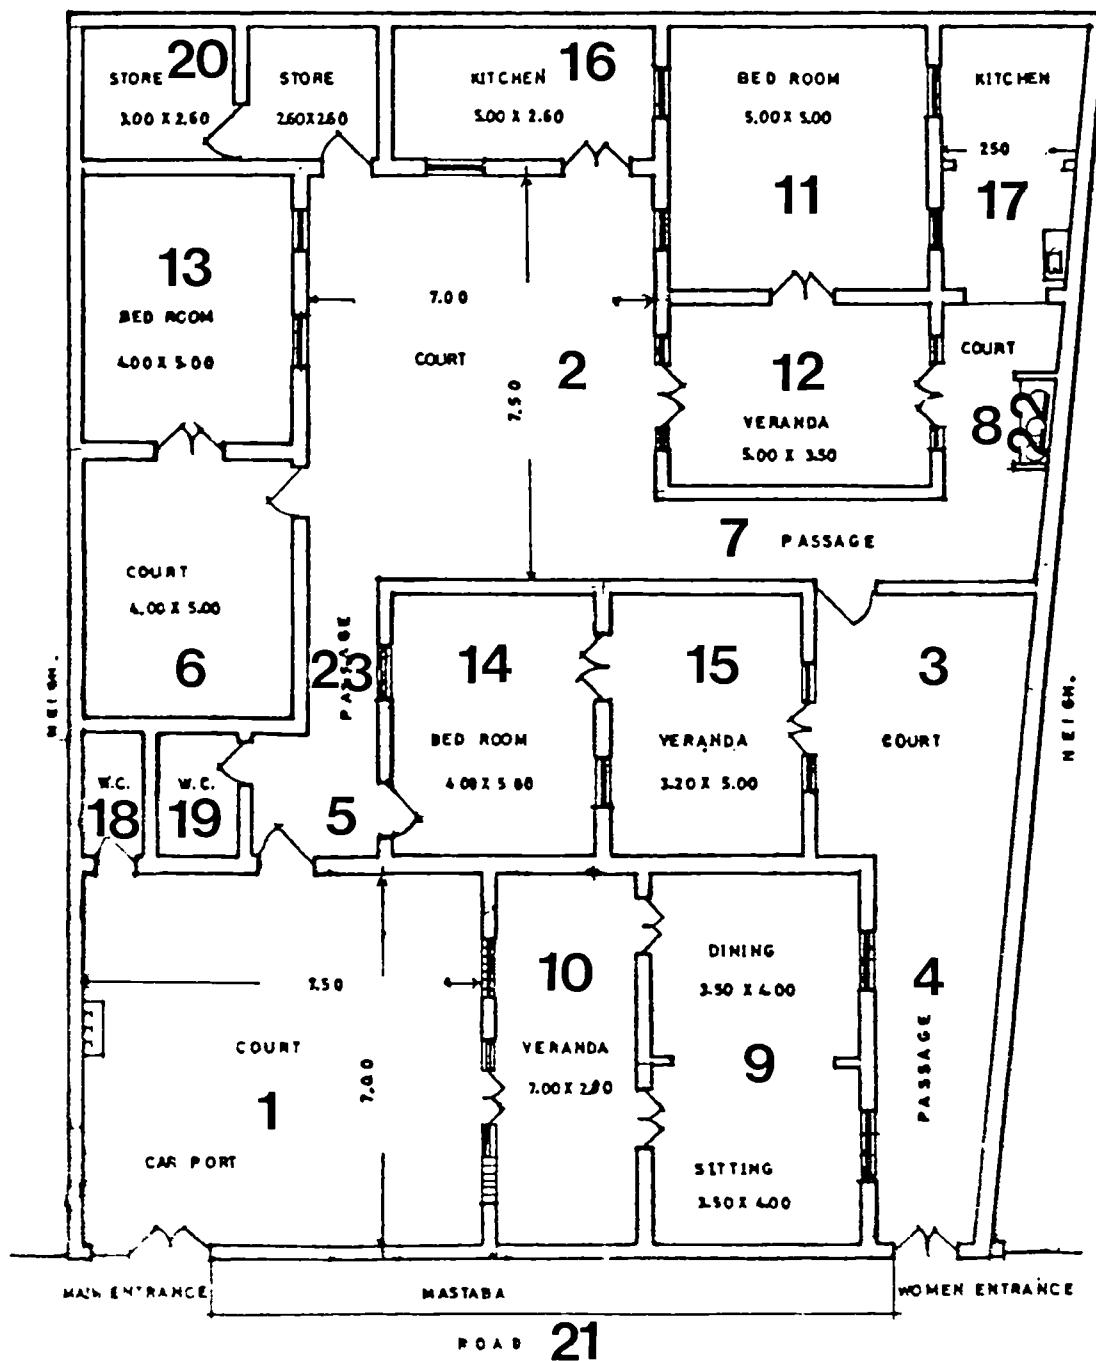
A SAMPLE DWELLING PLAN (AL-UMDA SHARQUE).
